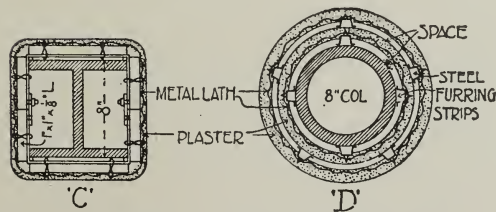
Metal Lath and Plaster T-section Column Covering.
